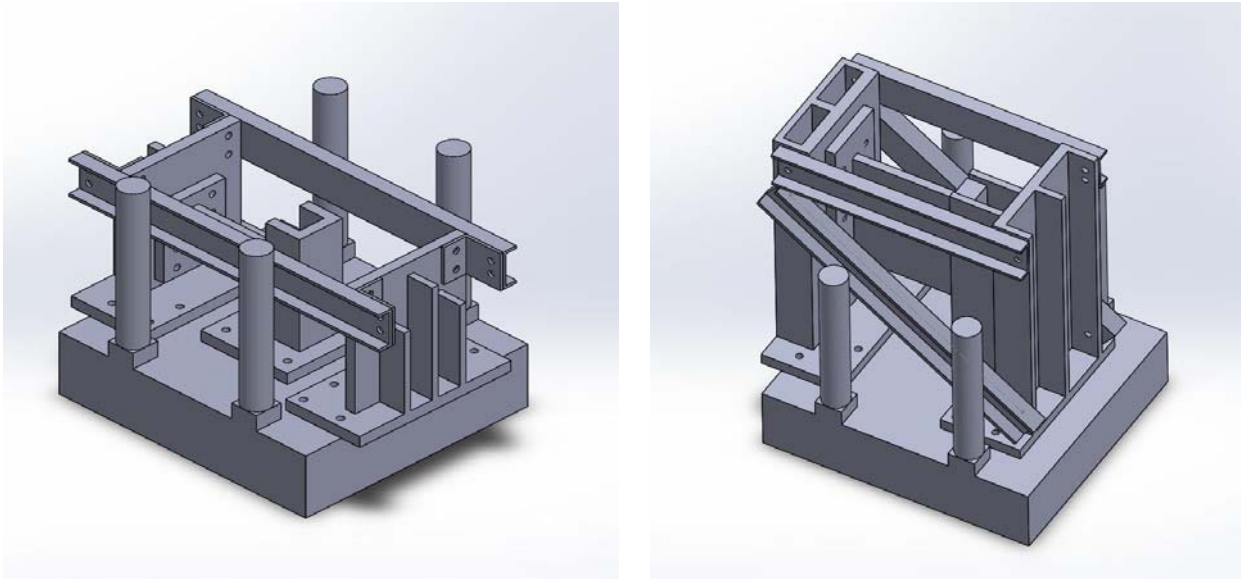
First steel frame set-ups. A) Simple frame structure (left); B) Diagonal reinforced frame structure (right)
